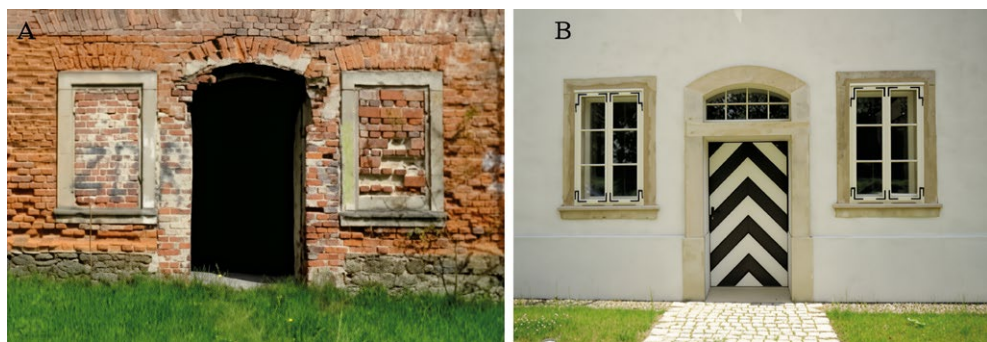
Reconstruction of windows and doors and restoration of façade: 2018 (A); 2024 (B) [Archives of the Department of Conservation of Monuments]
